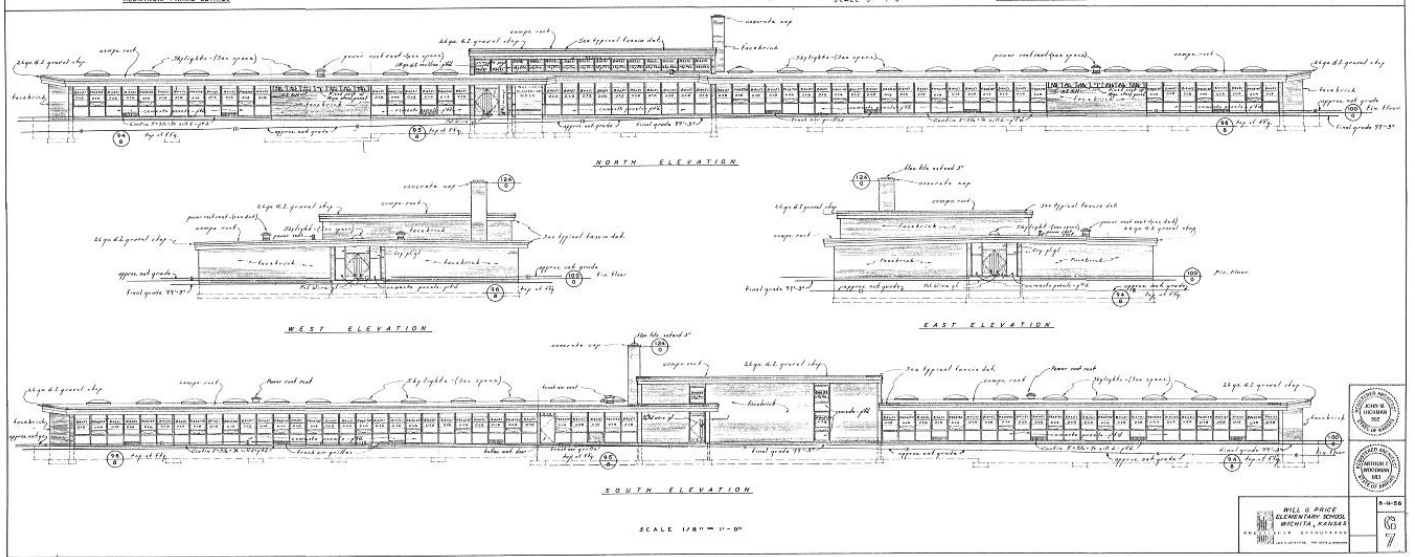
Floor and Roof Plan and Elevations from Original Drawings (Full set available at Kansas SHPO)
